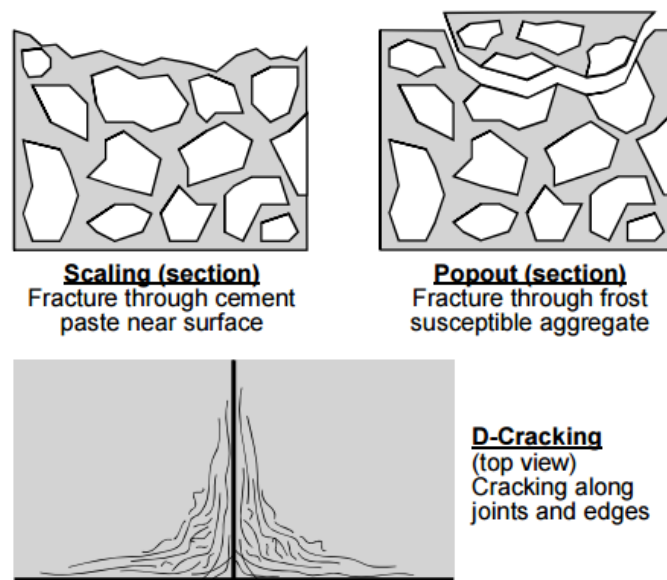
Forms of Freezing and Thawing Damage to Concrete (West et al. 1999)
